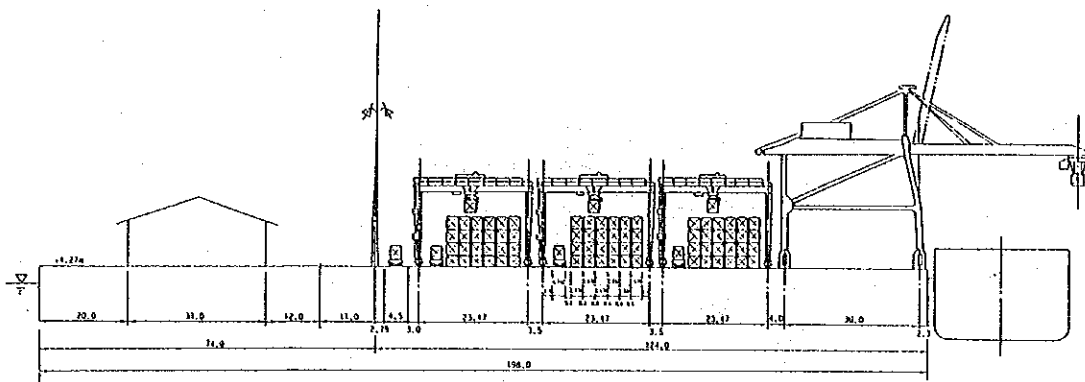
A Cross Section of No.4, 5 Berth and No.7, 8 (Unit: m)
